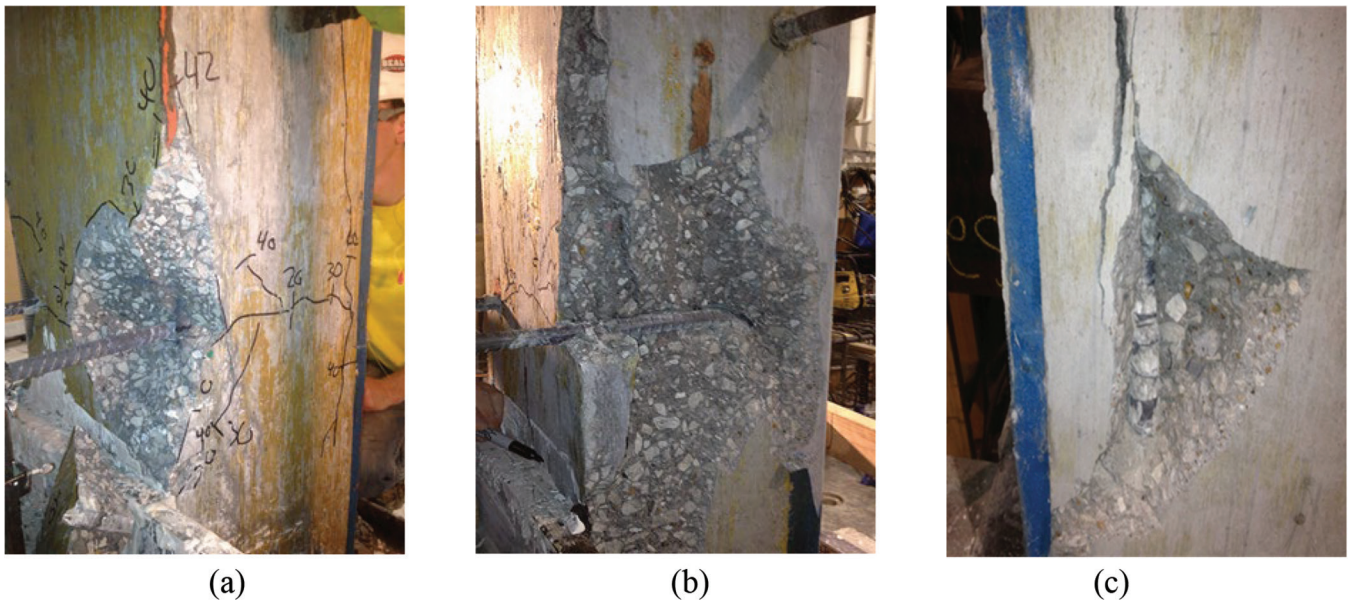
Failure modes: (a) front breakout (F); (b) side splitting (S); and (c) tail kickout (TK).
